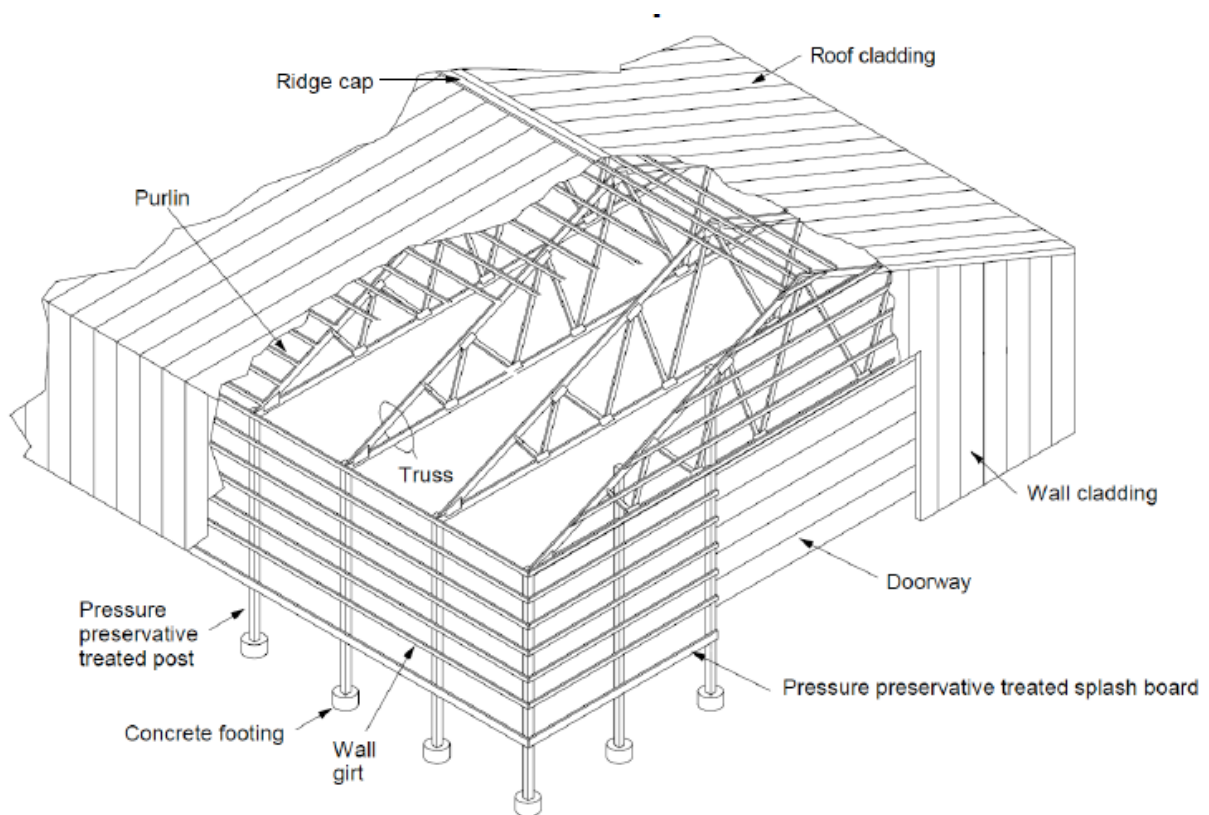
Typical post-frame building (Source: NFBA Design Manual)
